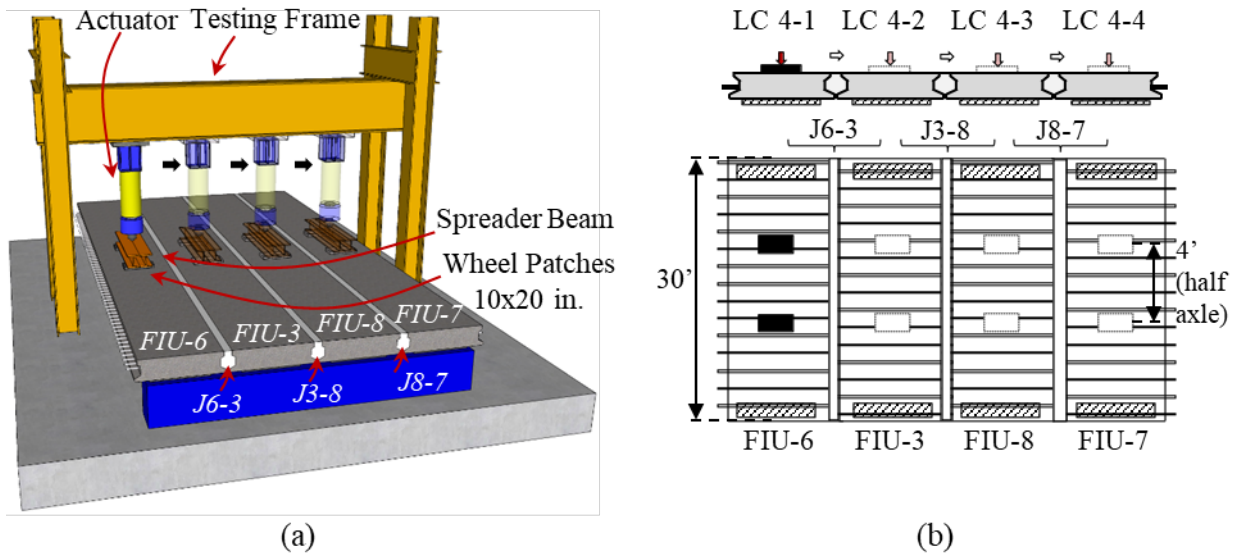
Test setup for Load Configuration 4-1 through 4-4 (a) schematic and (b) plan and elevation view
